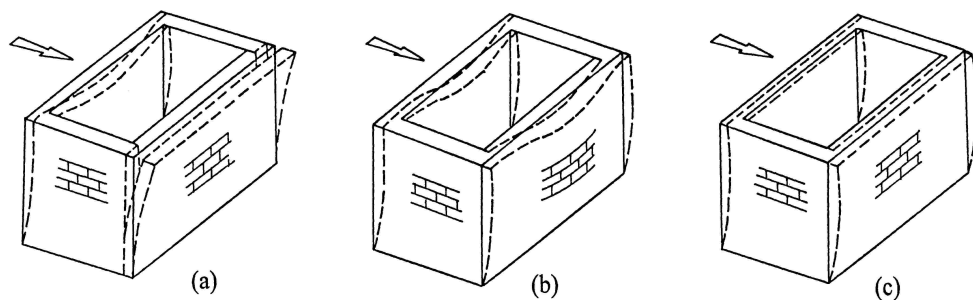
Behaviour of a) Wood (flexible) diaphragm without ring beams; b) Wood diaphragm with ring beams; c) rigid diaphragm with ring beams. [Ahmad, 2012]
